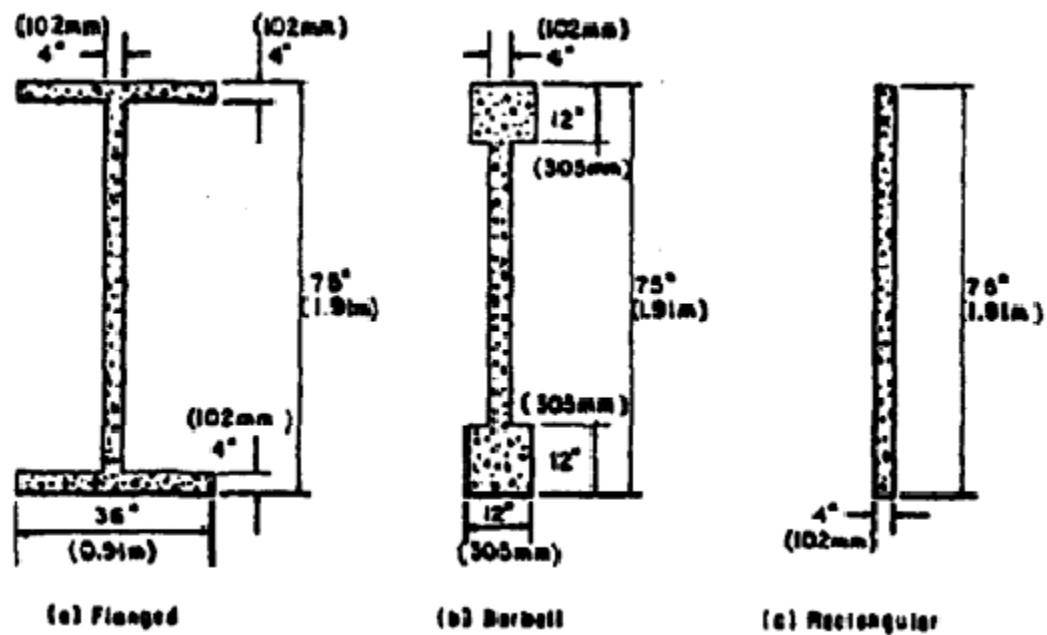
Wall sections tested by Oesterle et al. (1979)
